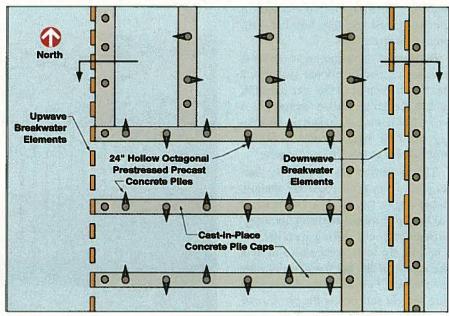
Proposed plan layout of piling, pile cap, and breakwater elements.
